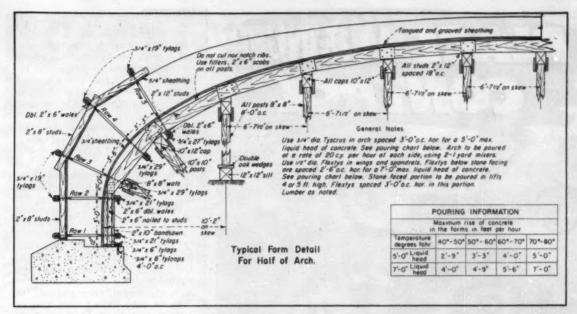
TYPICAL FORM DETAIL, as sketched for half of a bridge arch. Form ties are placed to assist in support and alignment at critical points. A lot of heavy lumber goes into a big job like this,
